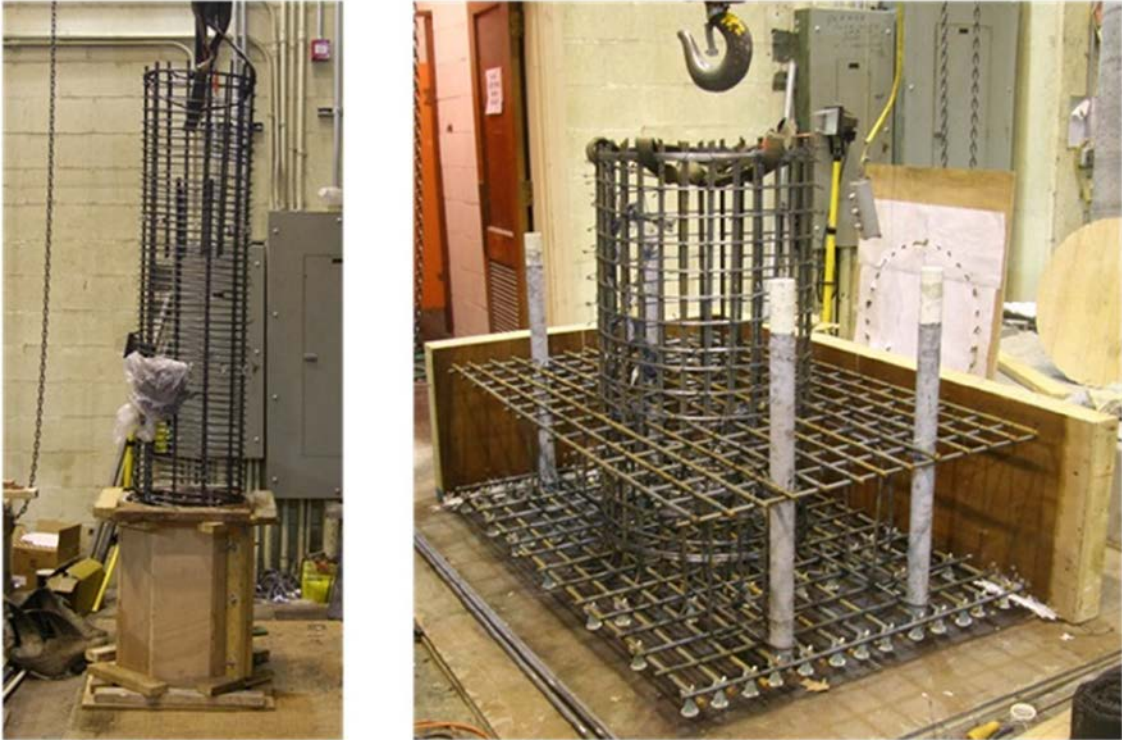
Photos. Column reinforcement (left) and shaft-footing reinforcement (right).
